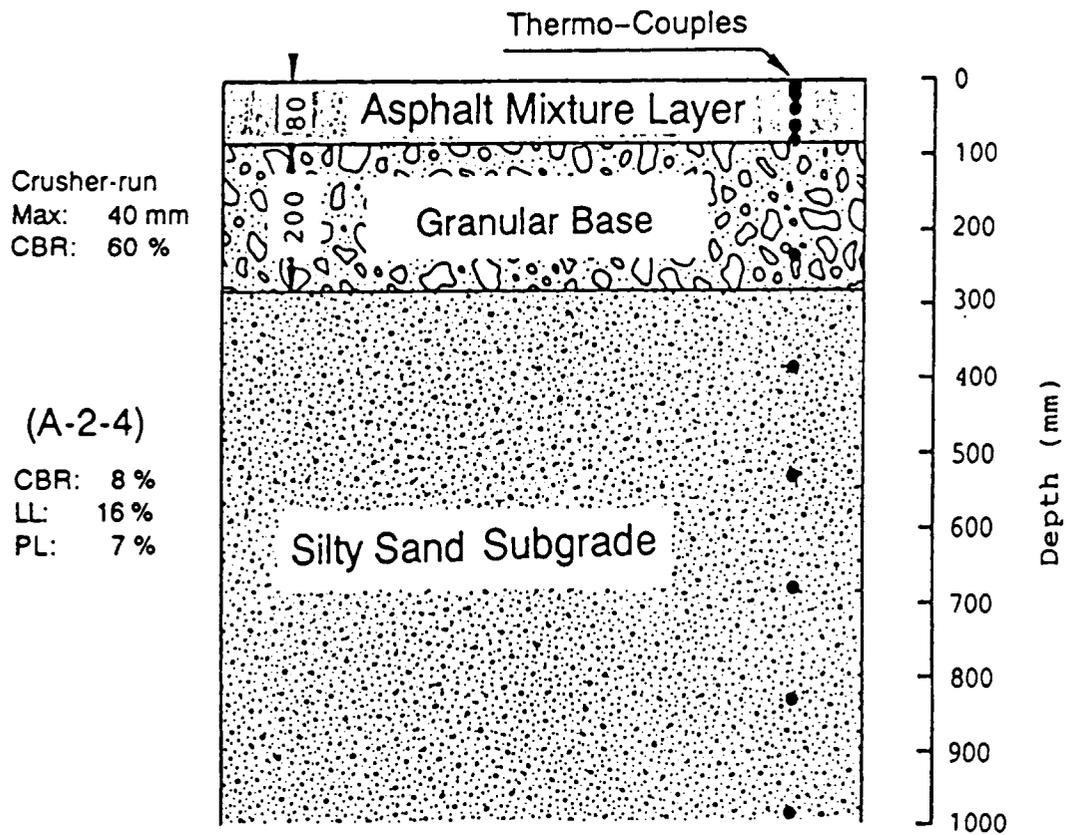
Pavement Test Section at the Hokkaido Institute of Technology, Sapporo, Hokkaido, Japan [82]
